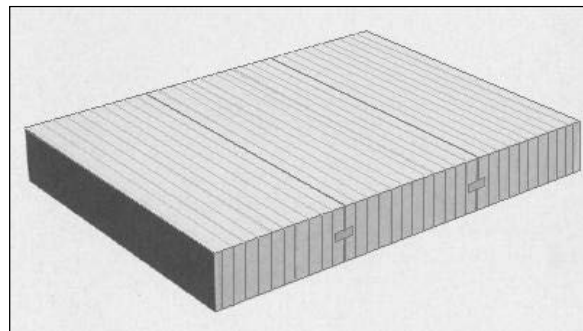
Edge-fixed timber floors (glued, with loose tongue joints) (Kolb 2008)
